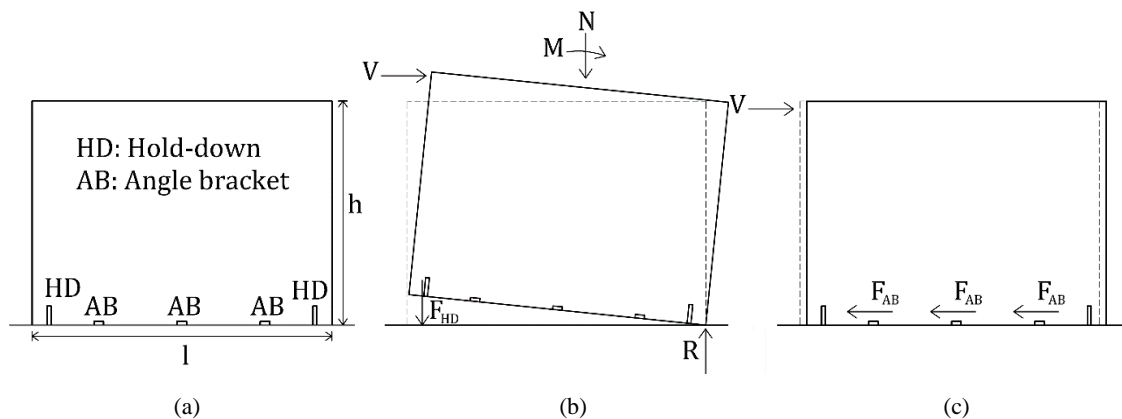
Typical CLT wall panel connected to the foundation with hold-downs and angle brackets (a), failure mechanisms considered for hold-down design (b) and angle bracket design (c).
